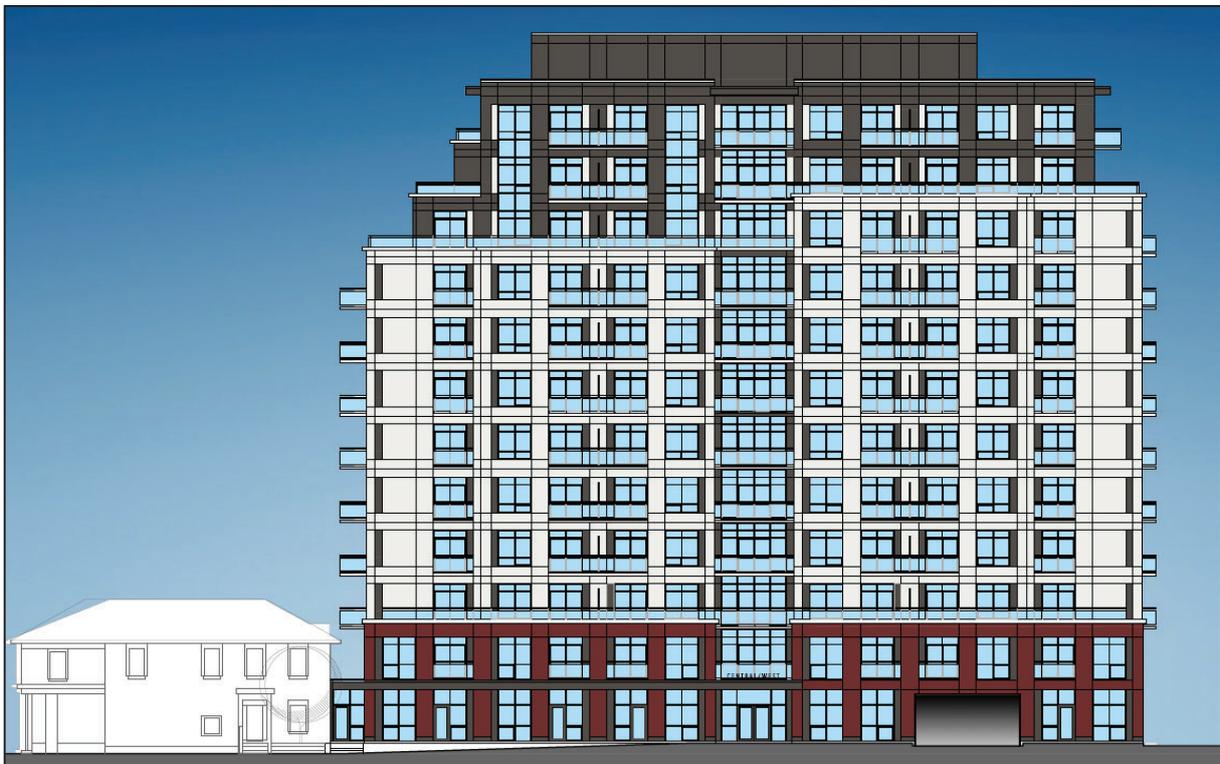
The North Elevation of the proposed apartment building (Westdell Development Corp., 2022).
